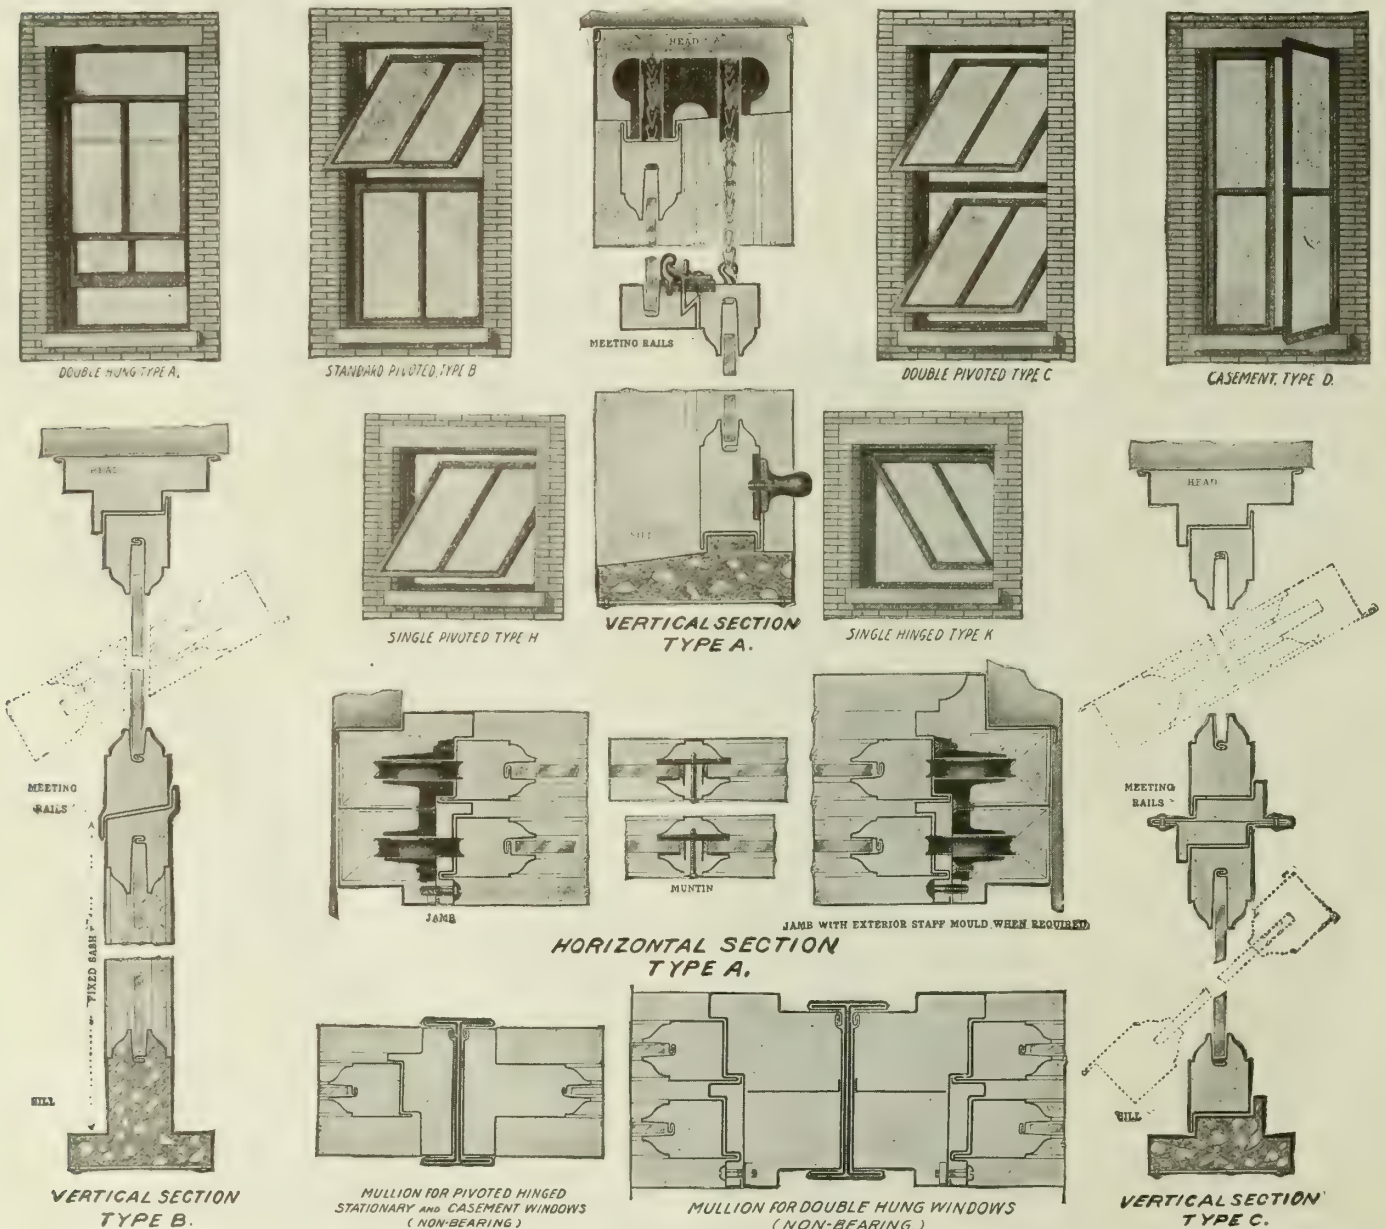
DETAILS OF MESKER FIREPROOF HOLLOW METAL WINDOWS
